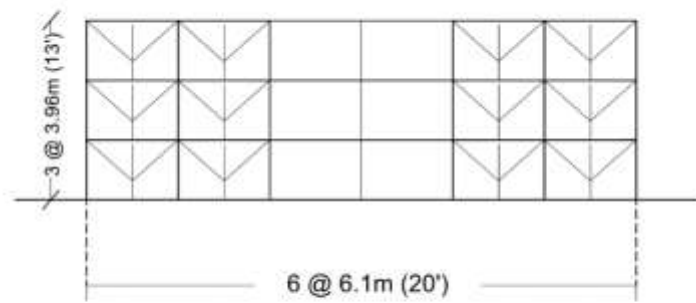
Elevation of 3-story eccentrically braced frame buildings for SCEBF-Y type
